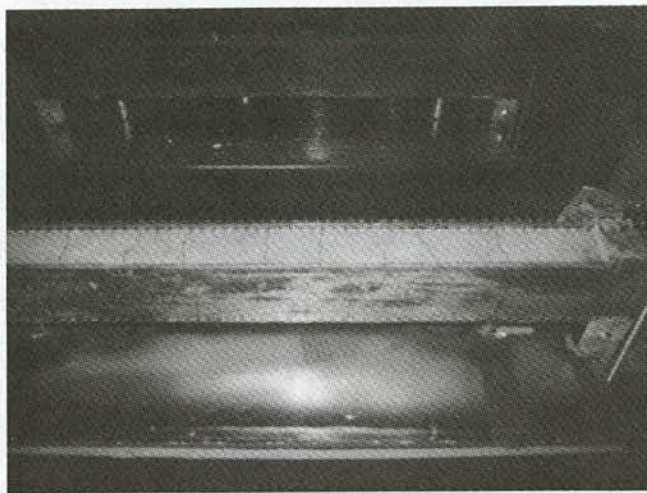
Typical cracks in pretensioned beams during corrosion tests.
